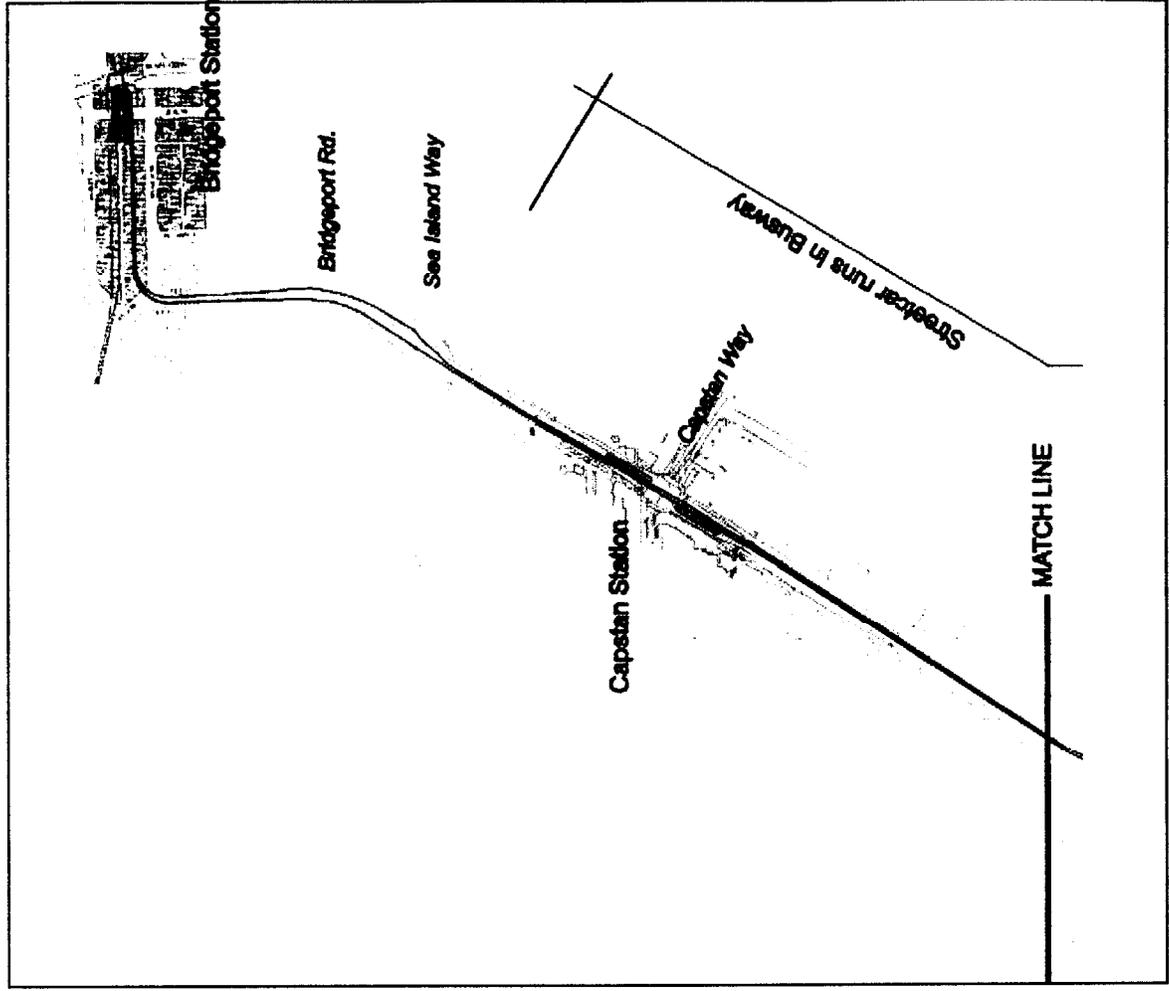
Streetcar Alignment on No. 3 Road (Part 2 of 3)
